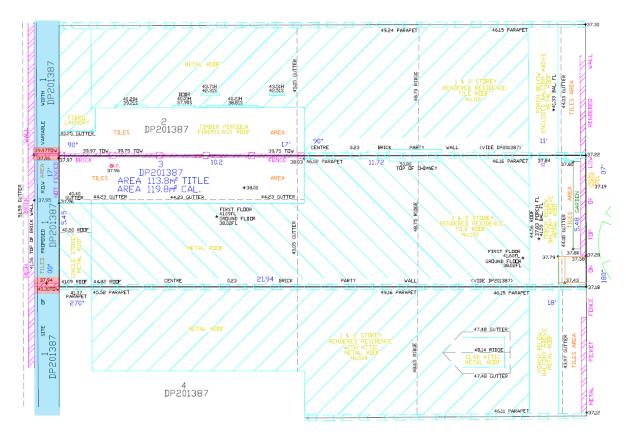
Survey Plan dated 2017 (source D/2022/783)
